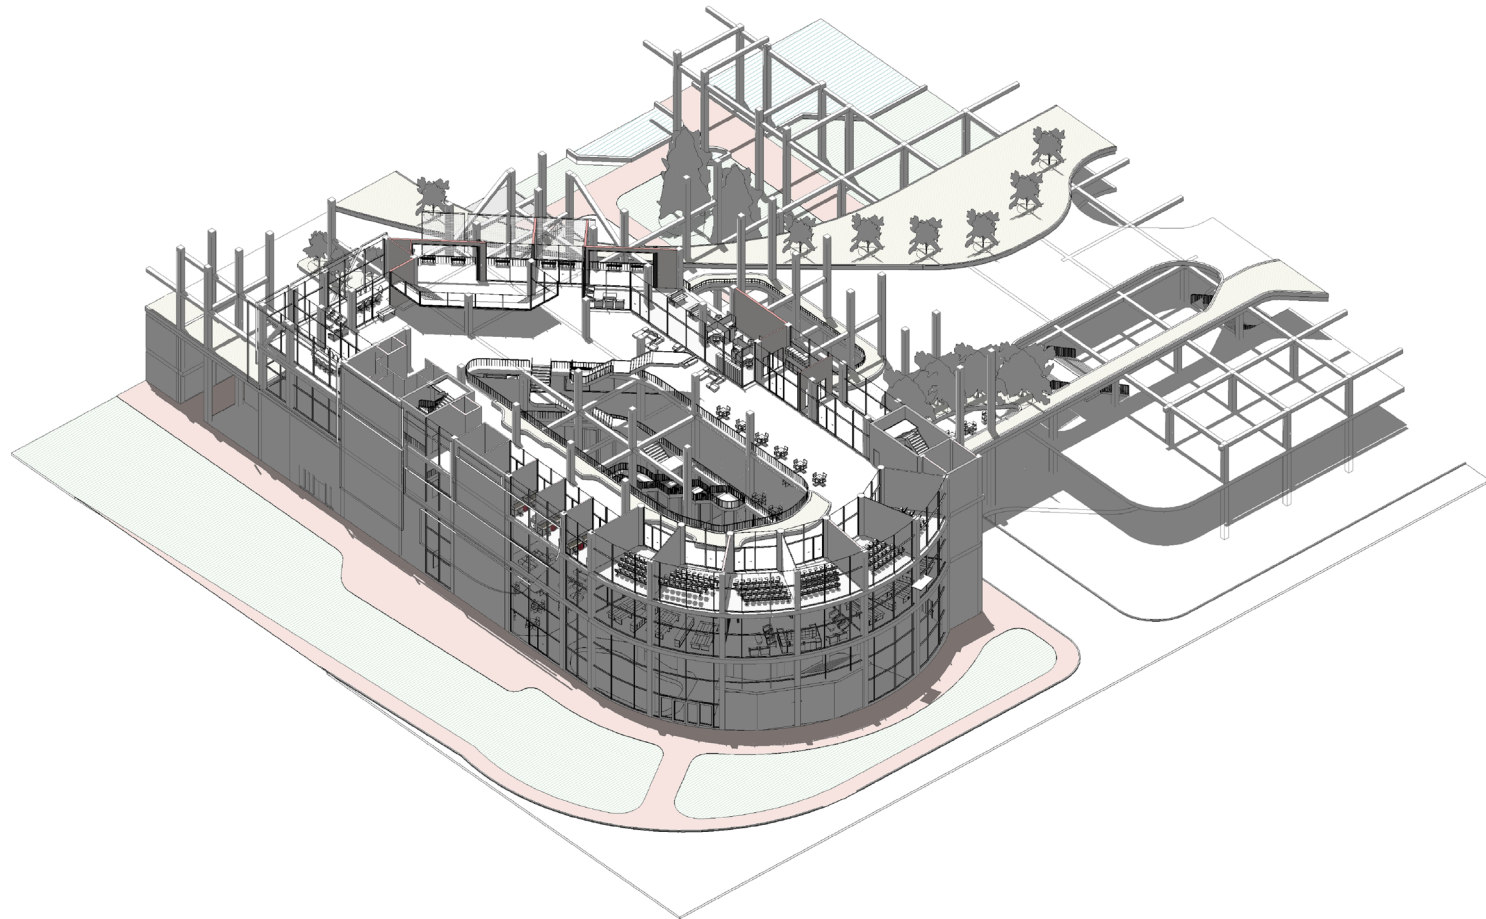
AXONOMETRIC SECOND FLOOR (AUTHOR 2021)
